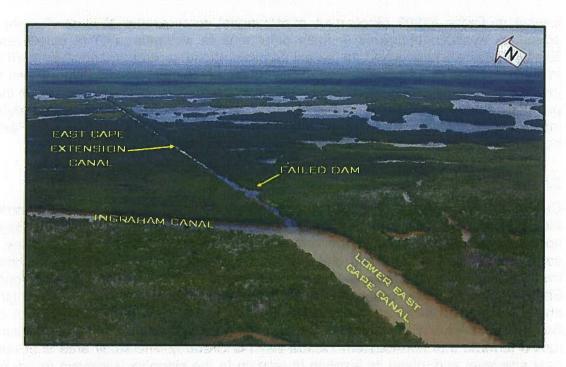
Aerial View of East Cape Extension Canal Failed Dam
